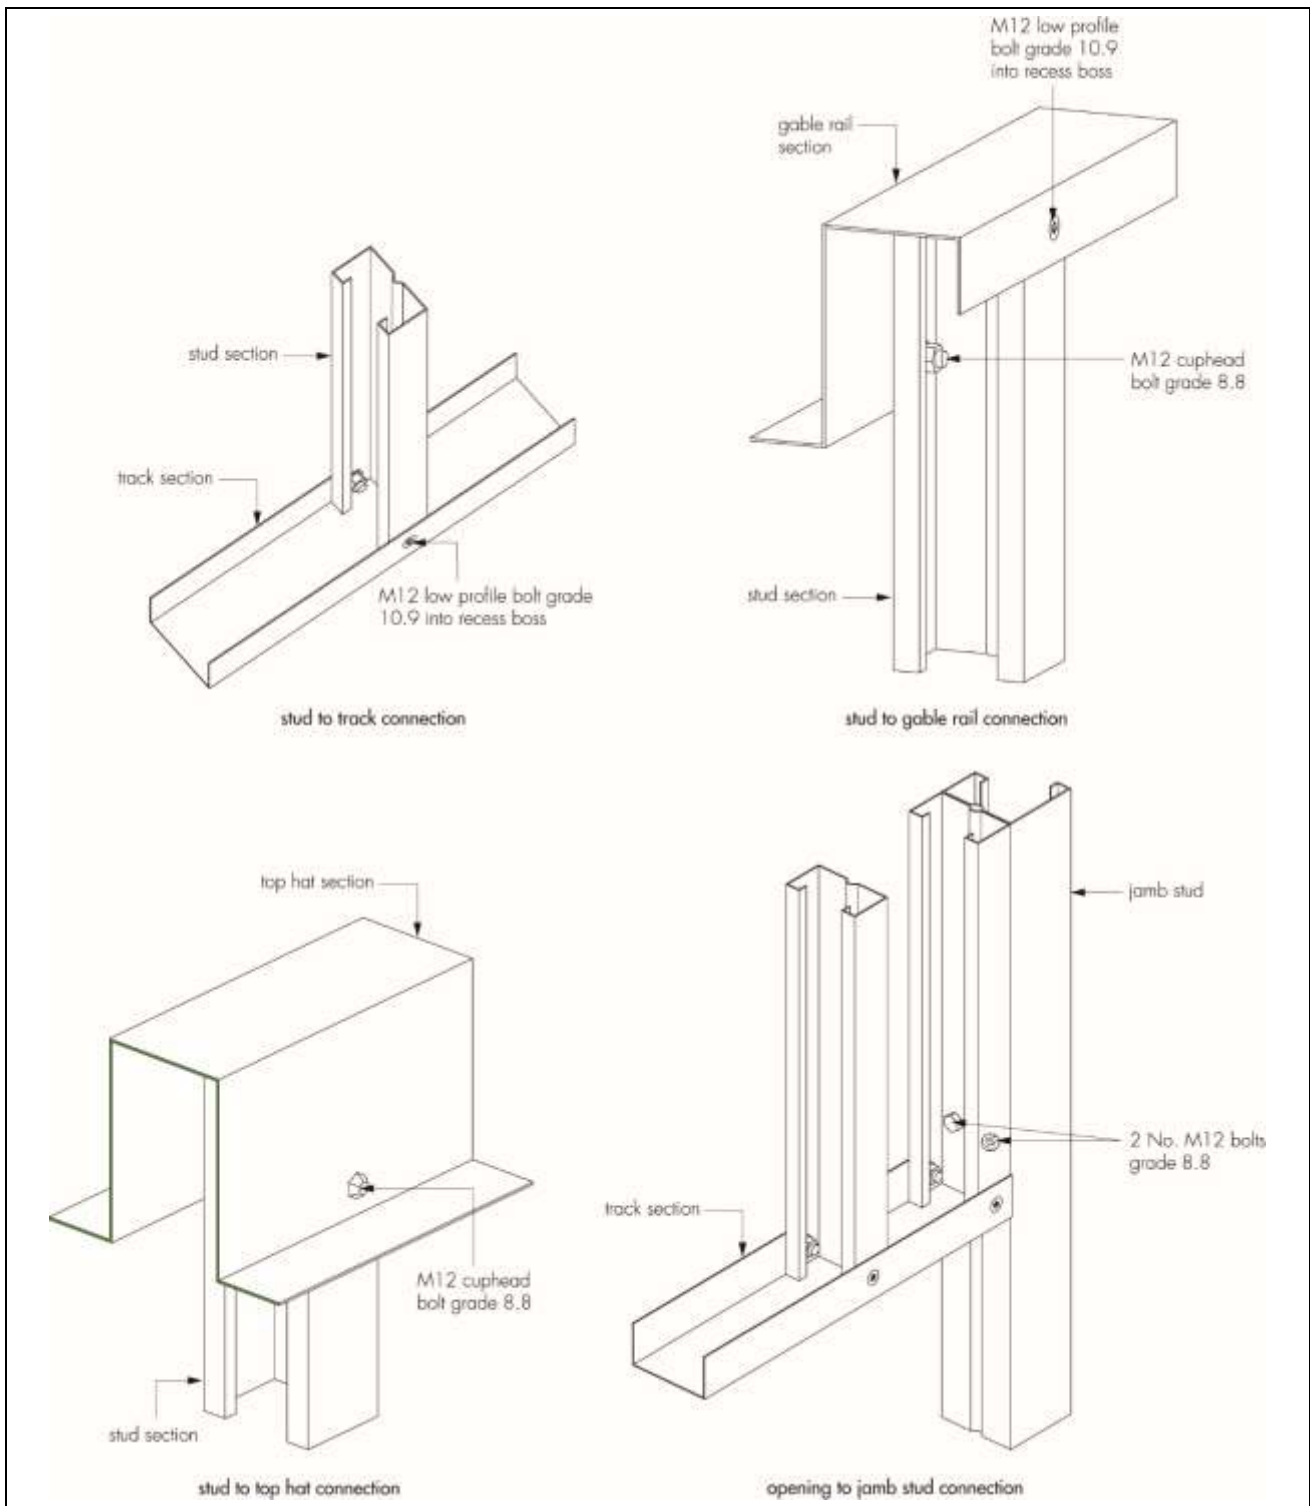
Stud to track, gable rail, top hat and jamb stud connections
